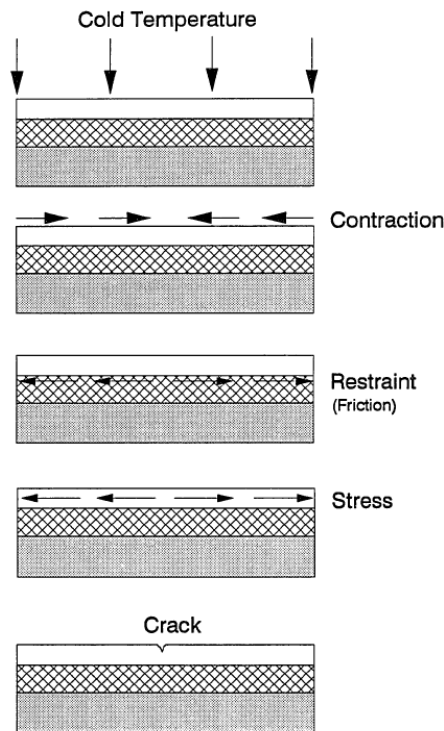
Asphalt concrete pavement thermal cracking schema (Jung D. et al., 1993)
